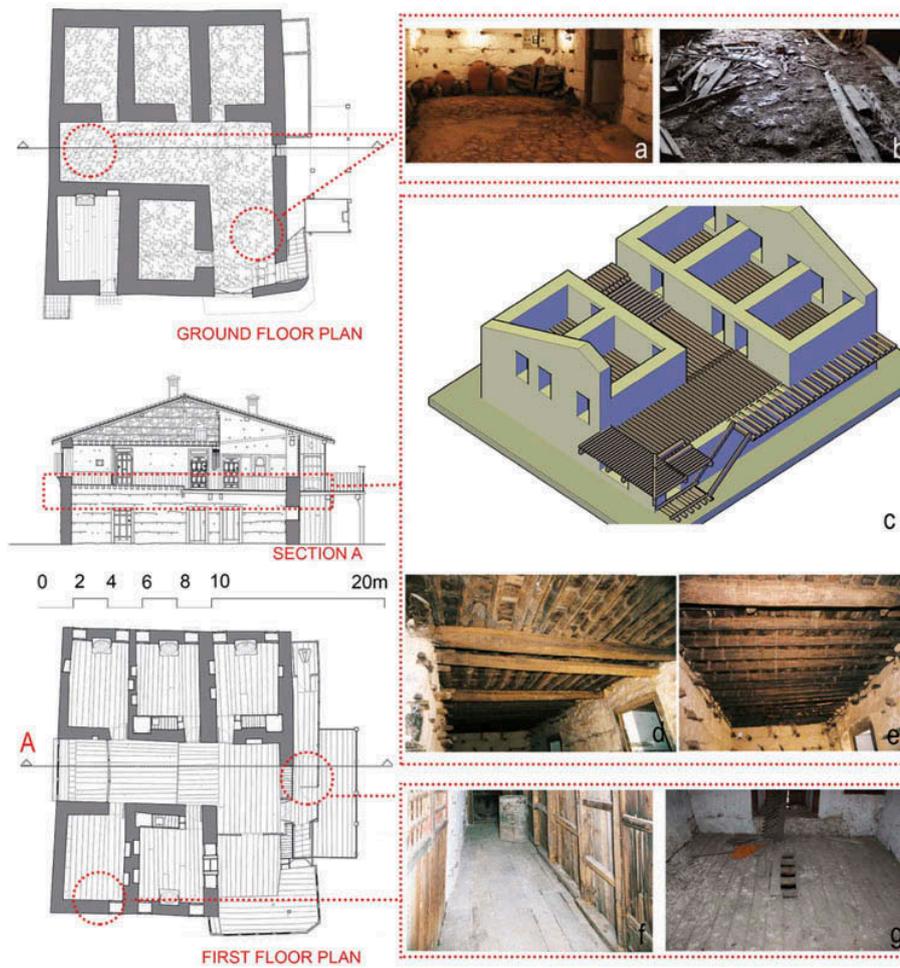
Detailed measured drawings and examples of: (c,d,e) timber floor construction, (a,b) ground floor covering, and (f,g) first floor covering of the Ömer Duruk Dwelling in the Bucakalan village.
